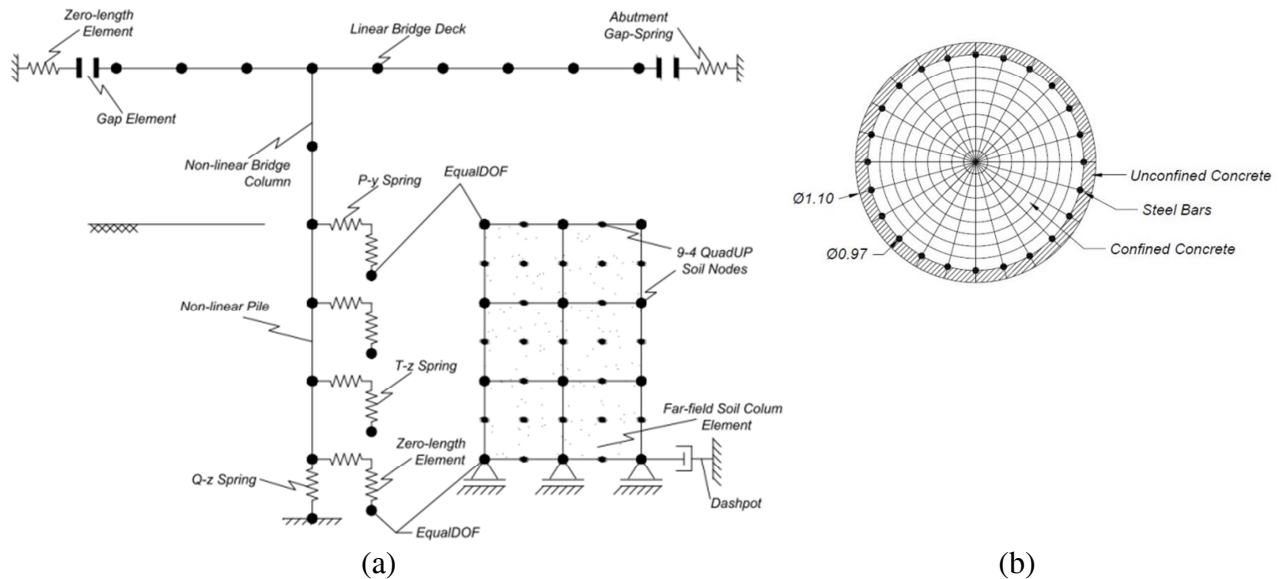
(a) Soil-bridge system analyzed, and (b) cross-section of bridge pile and column (all dimensions are in meters) [2].
